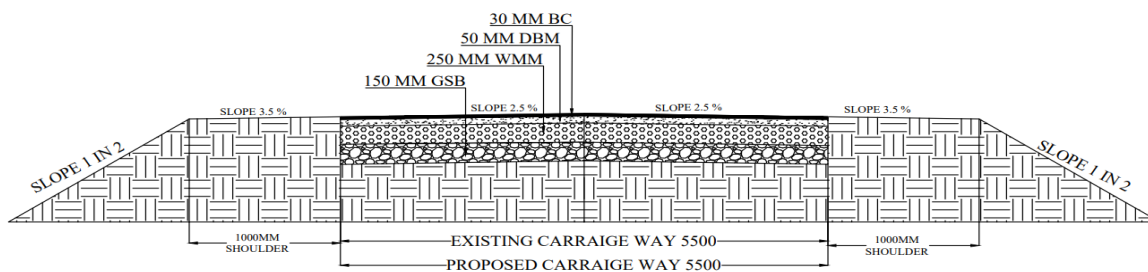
Typical Cross Section of modified soil subgrade with CBR 8.90
